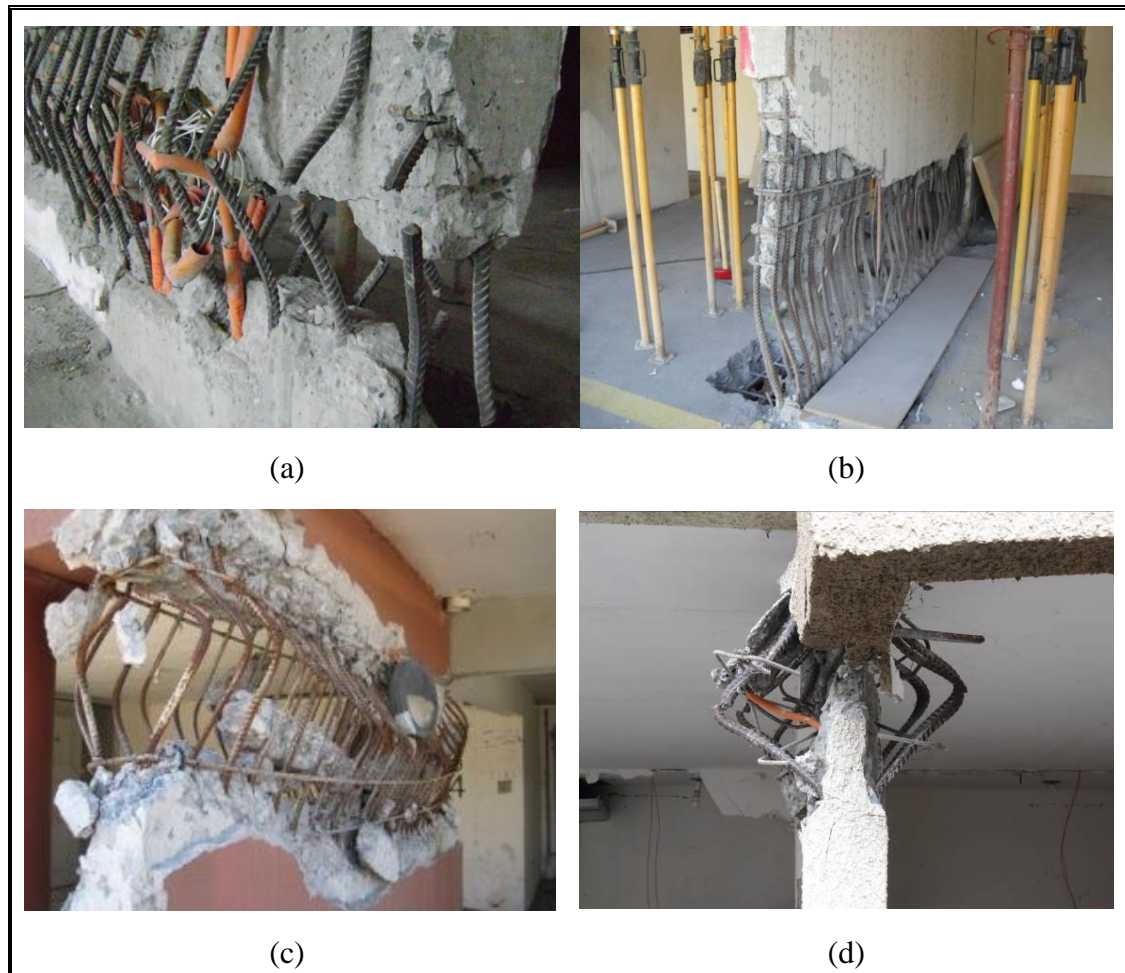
Typical thin wall failure. Buildings (a), (b): AH-2, (c) CM-3 and (d) PR-6.
